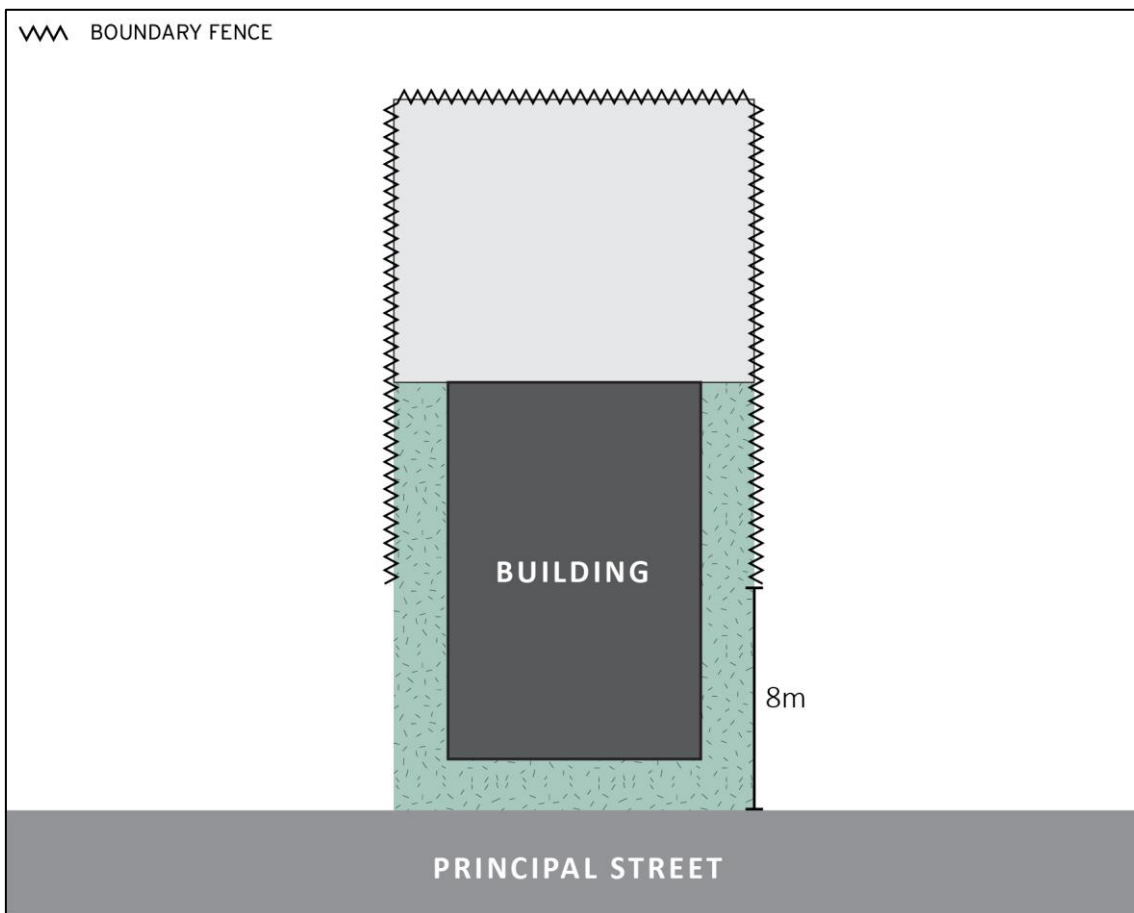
Construction of a new timber paling fence, which is visible from a street, is exempt if located in this area
